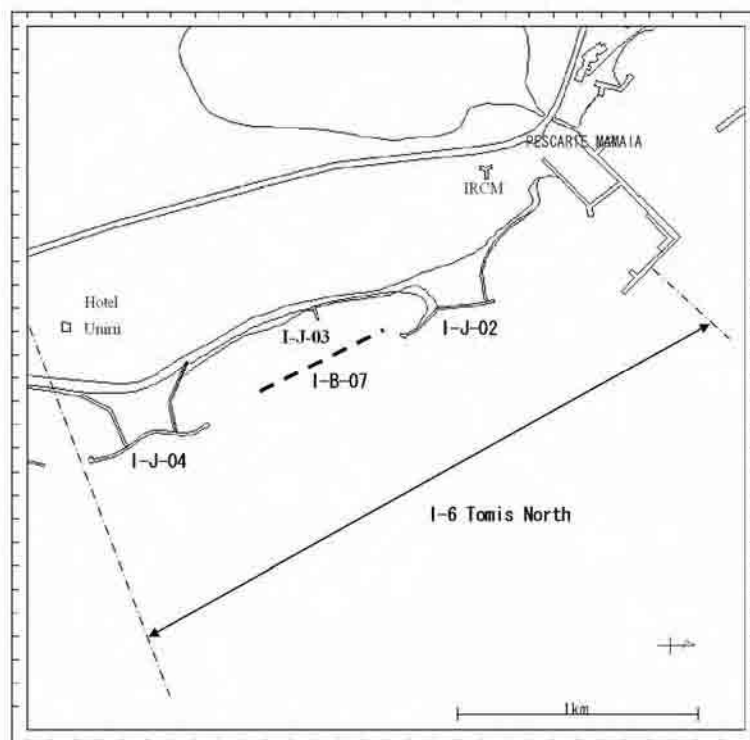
Location map of existing shore protection facilities (2)
